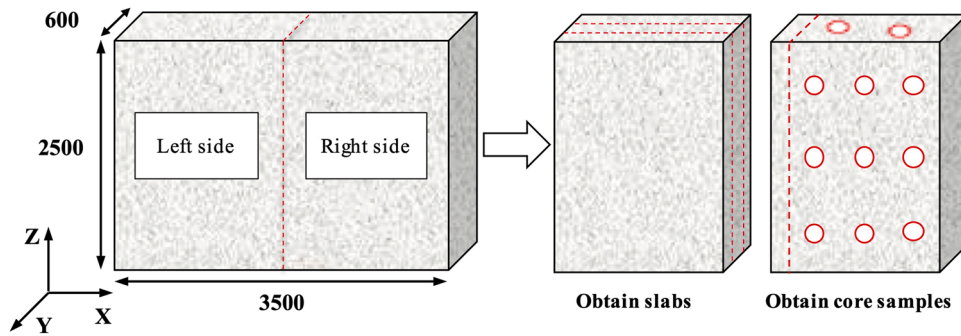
Foundation wall cutting diagram (dimensions in mm).
